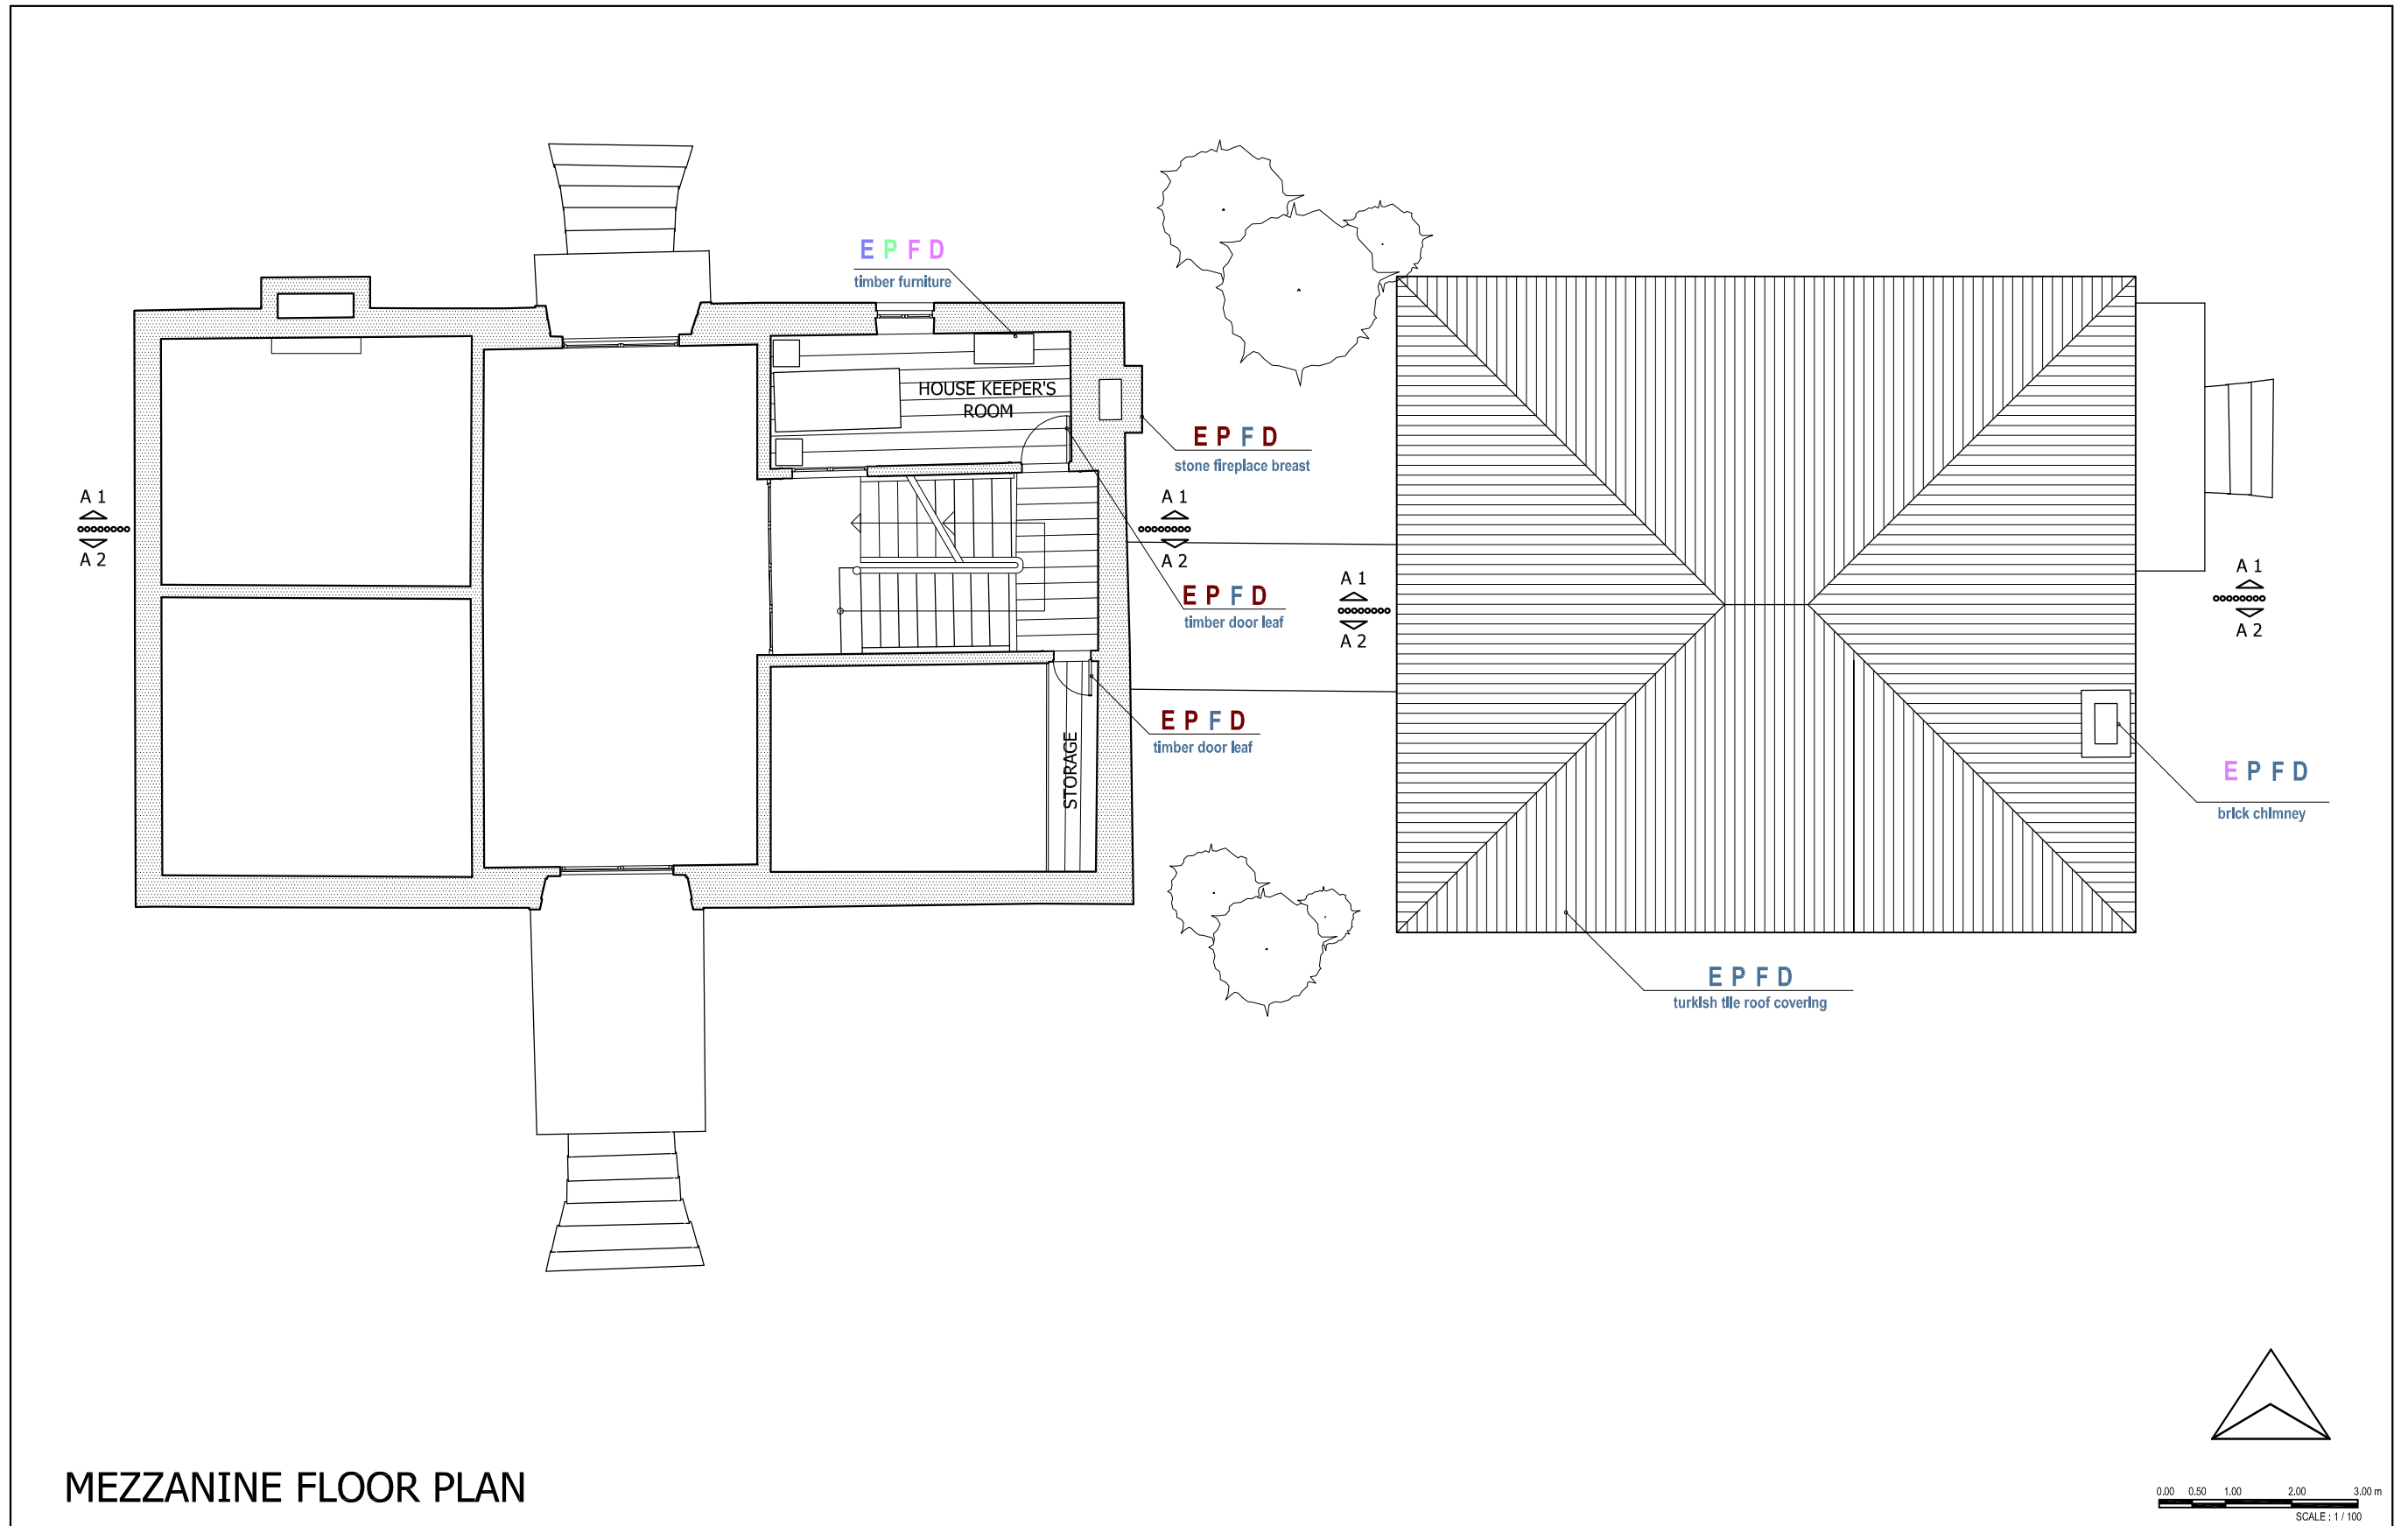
Sources of Restitution - Mezzanine Floor Plan
